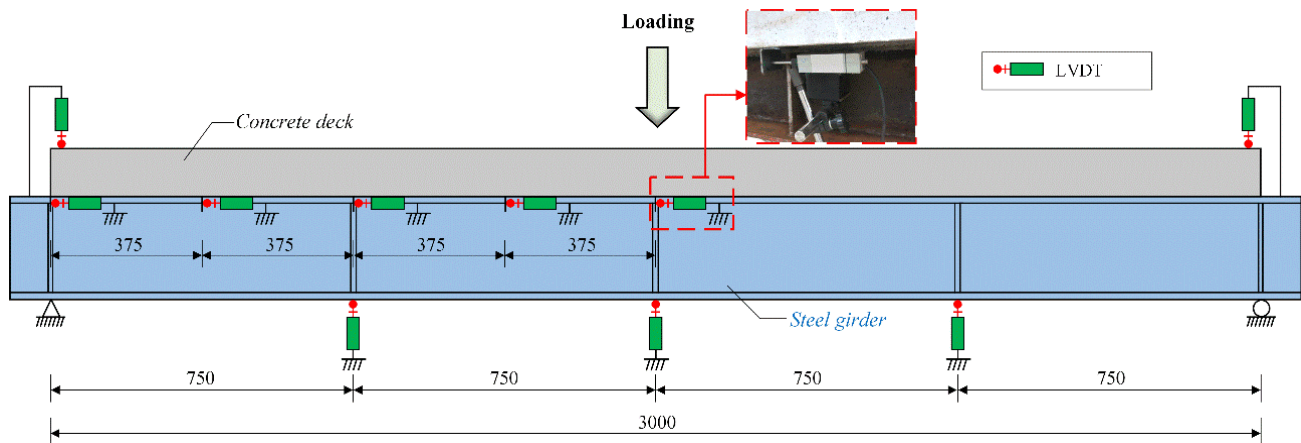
Measuring-point layout of the specimen (units are in mm)
